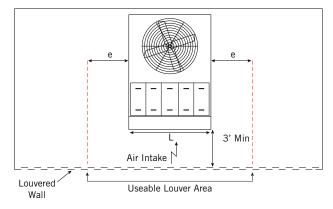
Plan View of Single Air Intake Unit in Enclosure with Louvered Walls
